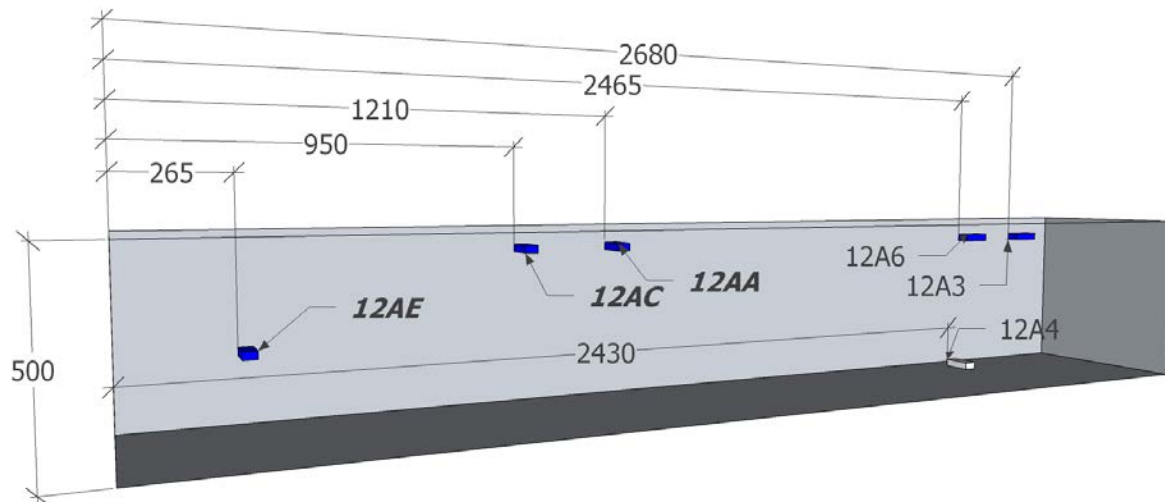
The sensors (small dark boxes except for one light grey) were installed in the horizontally oriented concrete column (big gray box) according to this drawing [mm].
